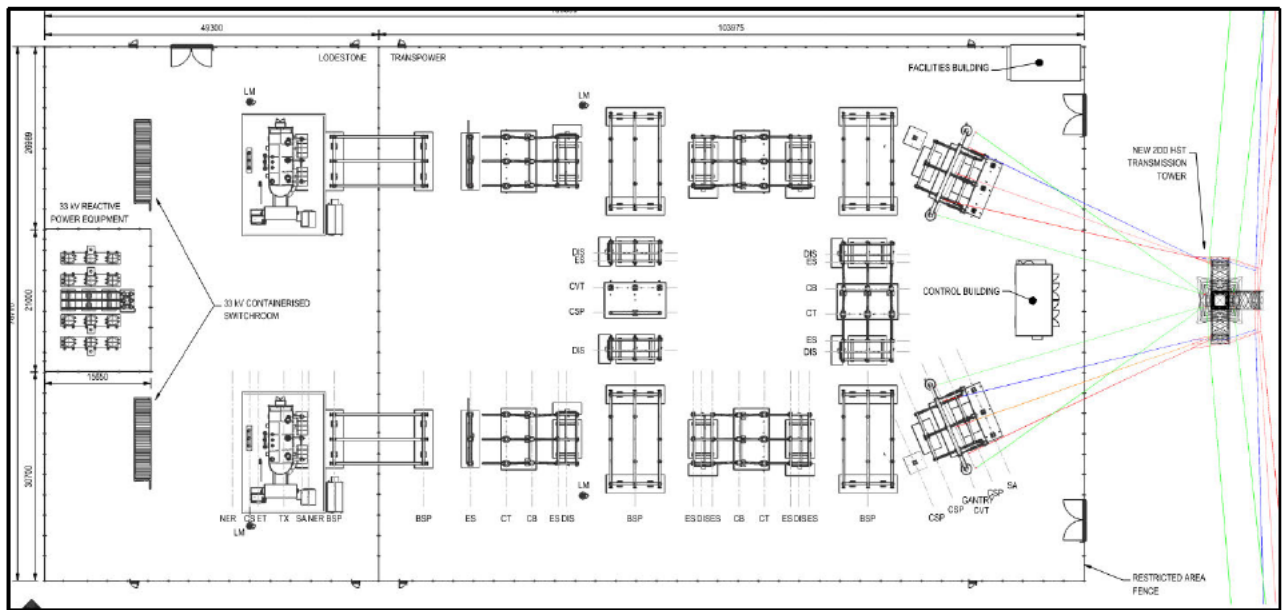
Haldon collector and 220 kV substation layout drawing (refer to drawing 2429039-UP-002)
